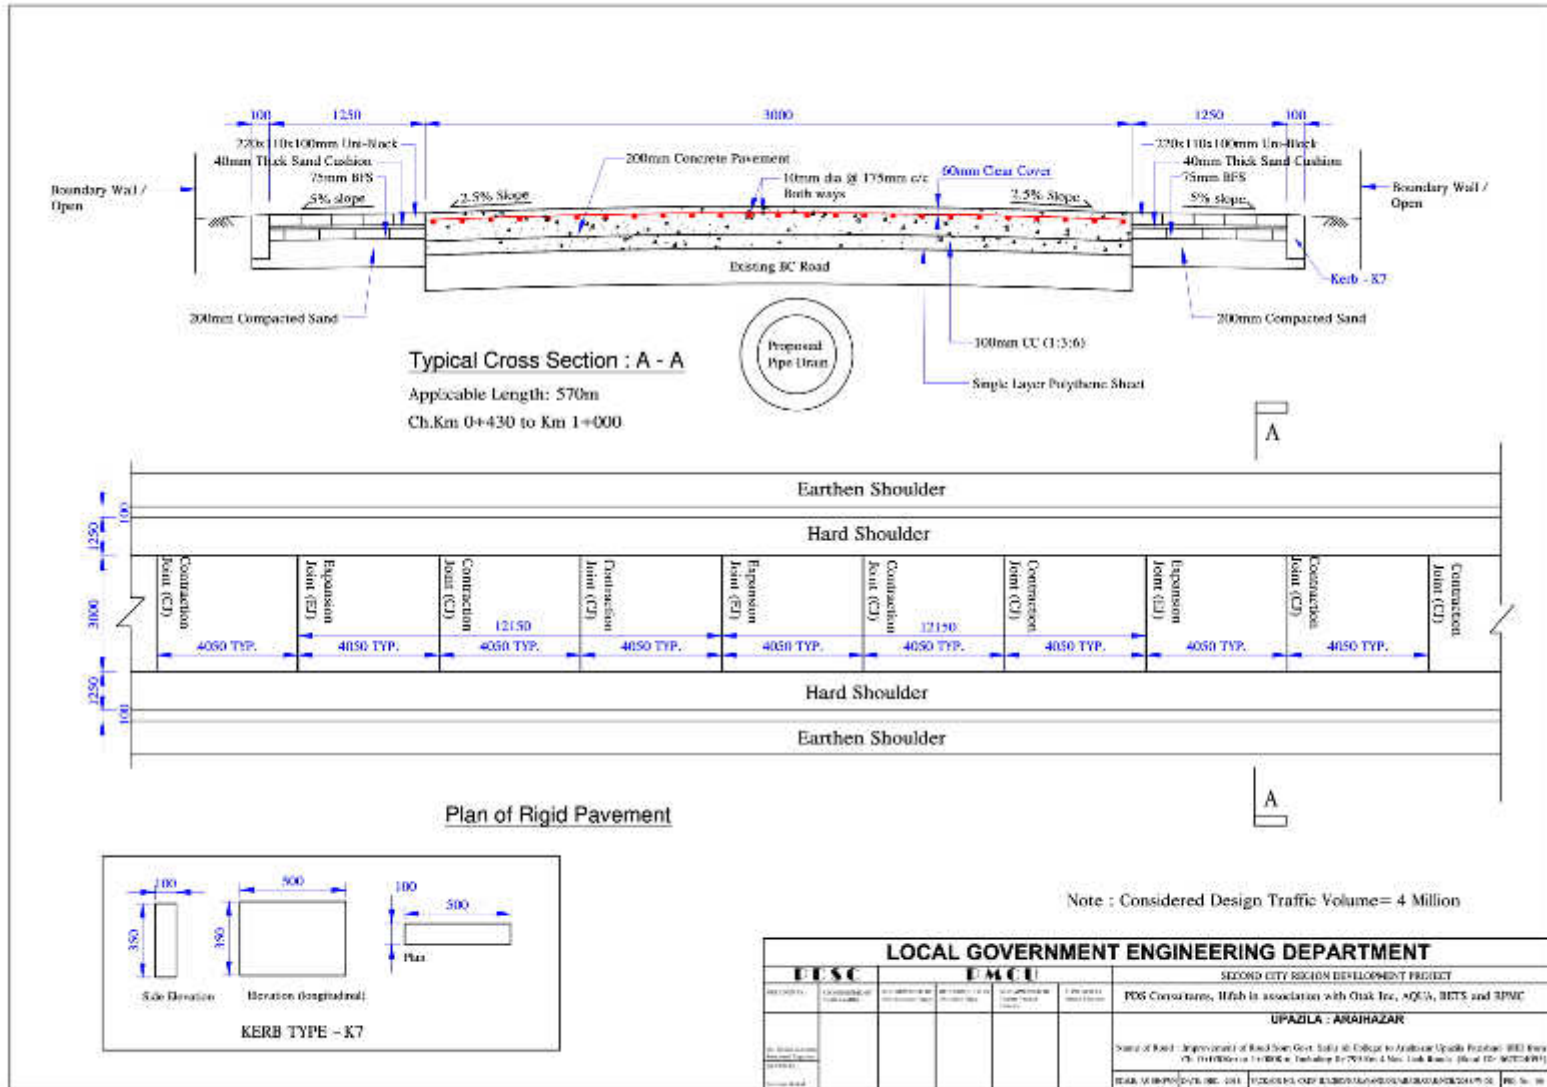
Typical Cross section of the Road (Ch. 0+430 - 1+000 km)
